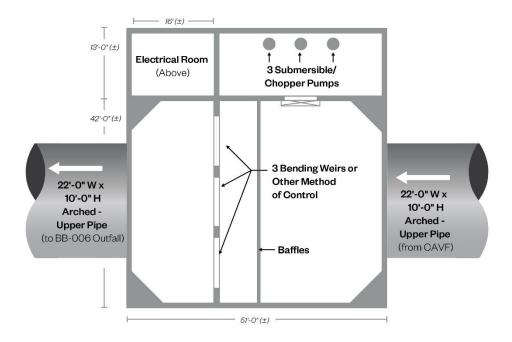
Layout of Alternative 9-3 – Outfall Storage Pumping Station for BB-006
